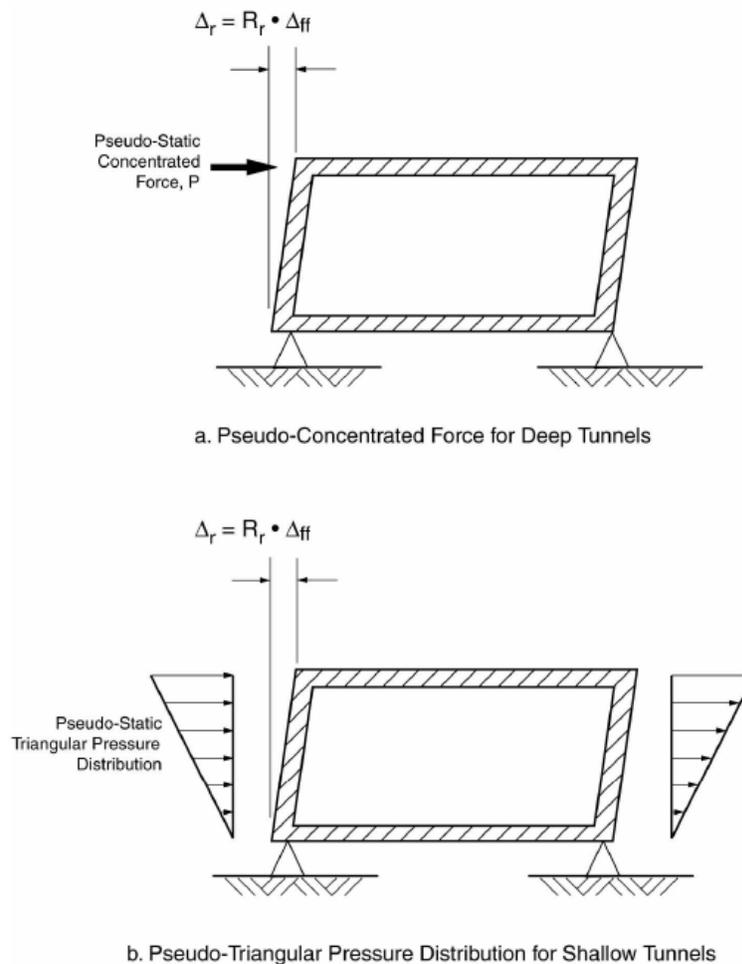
Simplified Racking Frame Analysis of a Rectangular Tunnel (MCEER-06-SP11, Modified from Wang, 1993)
